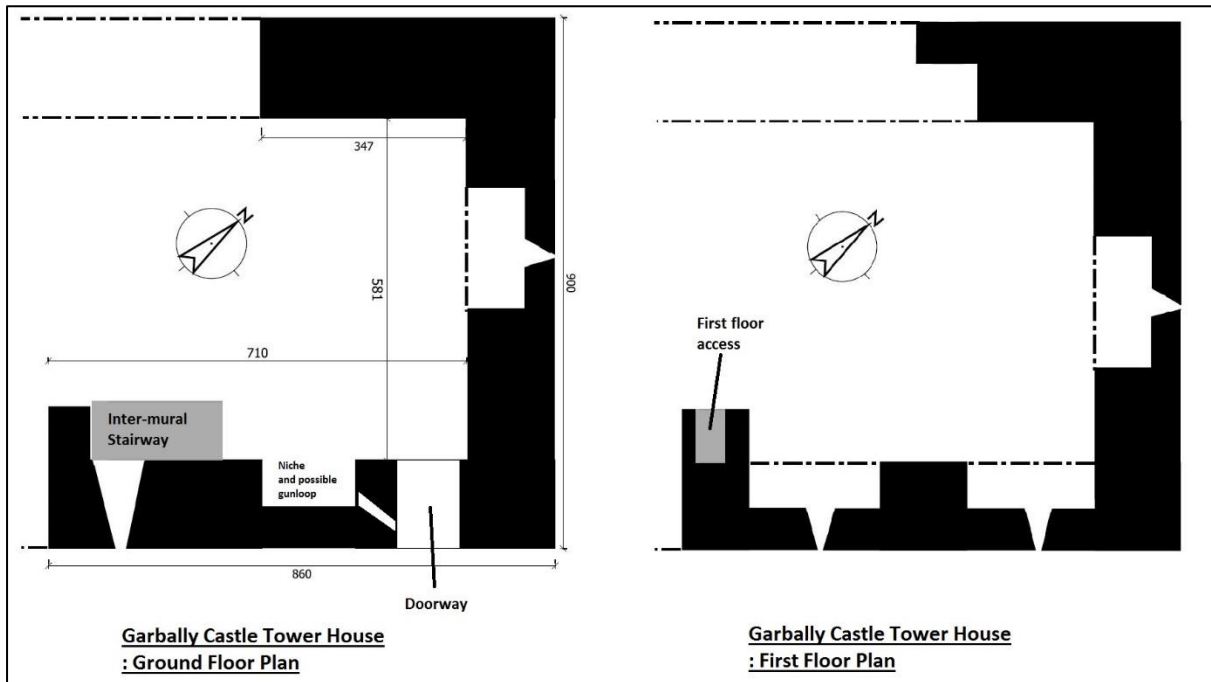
Plan of the surviving elements of the ground and first floors of Garbally Castle tower house.
